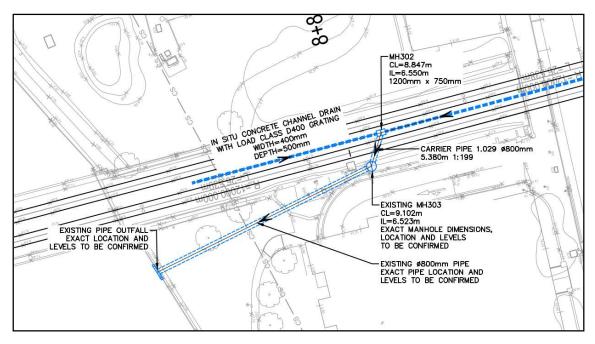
Proposed Drainage Works at Liffey River Outfall
